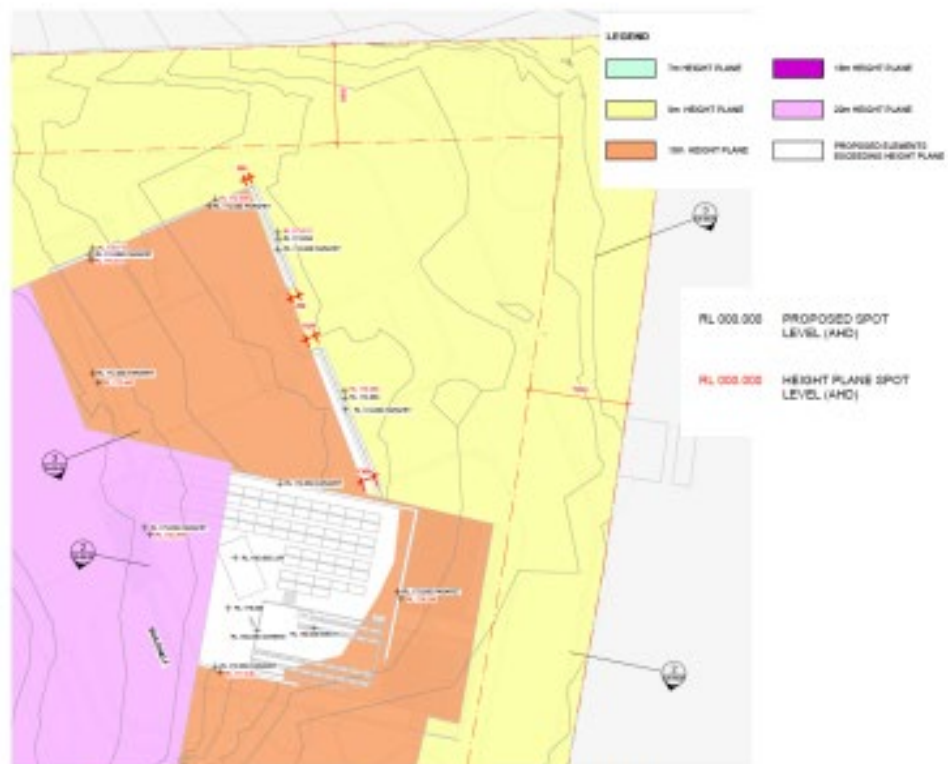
Height exceedance plan – Building F (Cox drawing DA-99-09)
